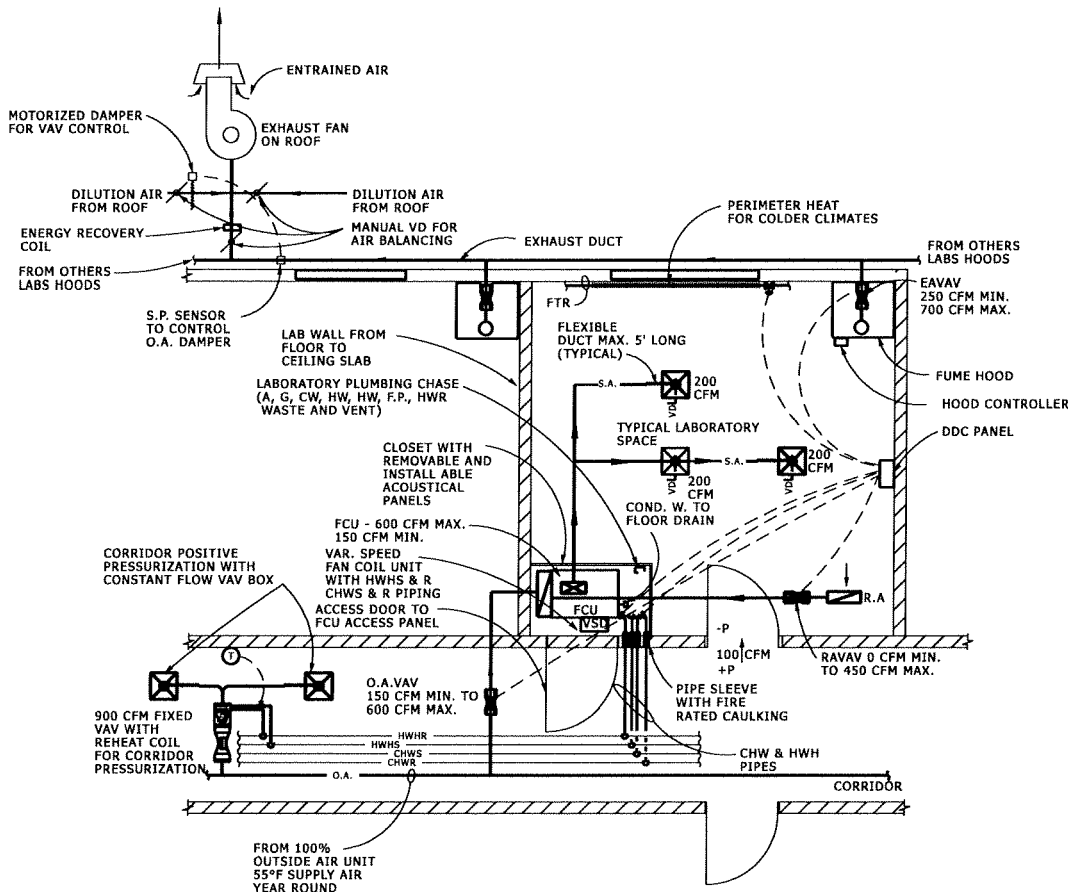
TYPICAL LAB - ONE FCU PER LAB - PLAN VIEW
